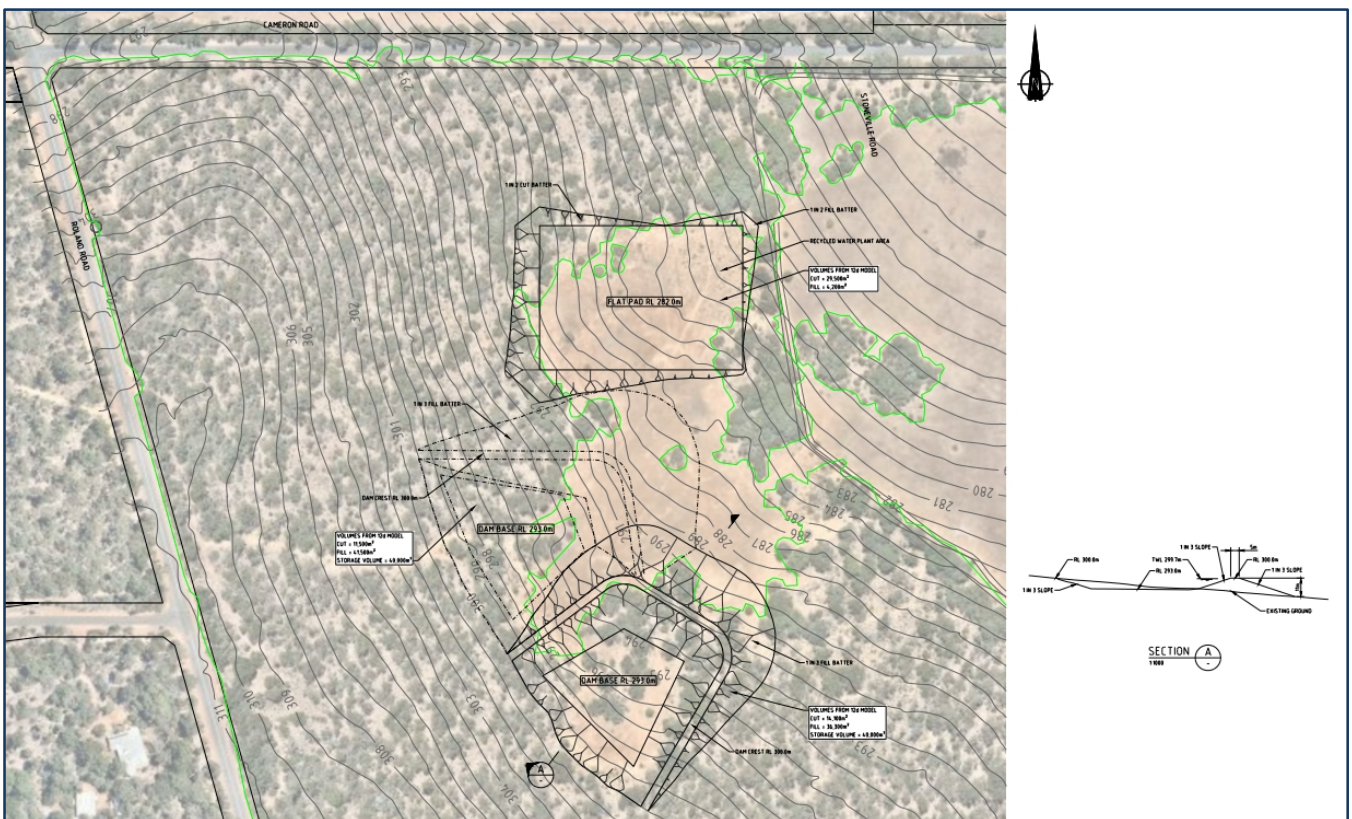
Concept Earthworks Design for 40,000 kL Storage Dam (Appendix 3)
